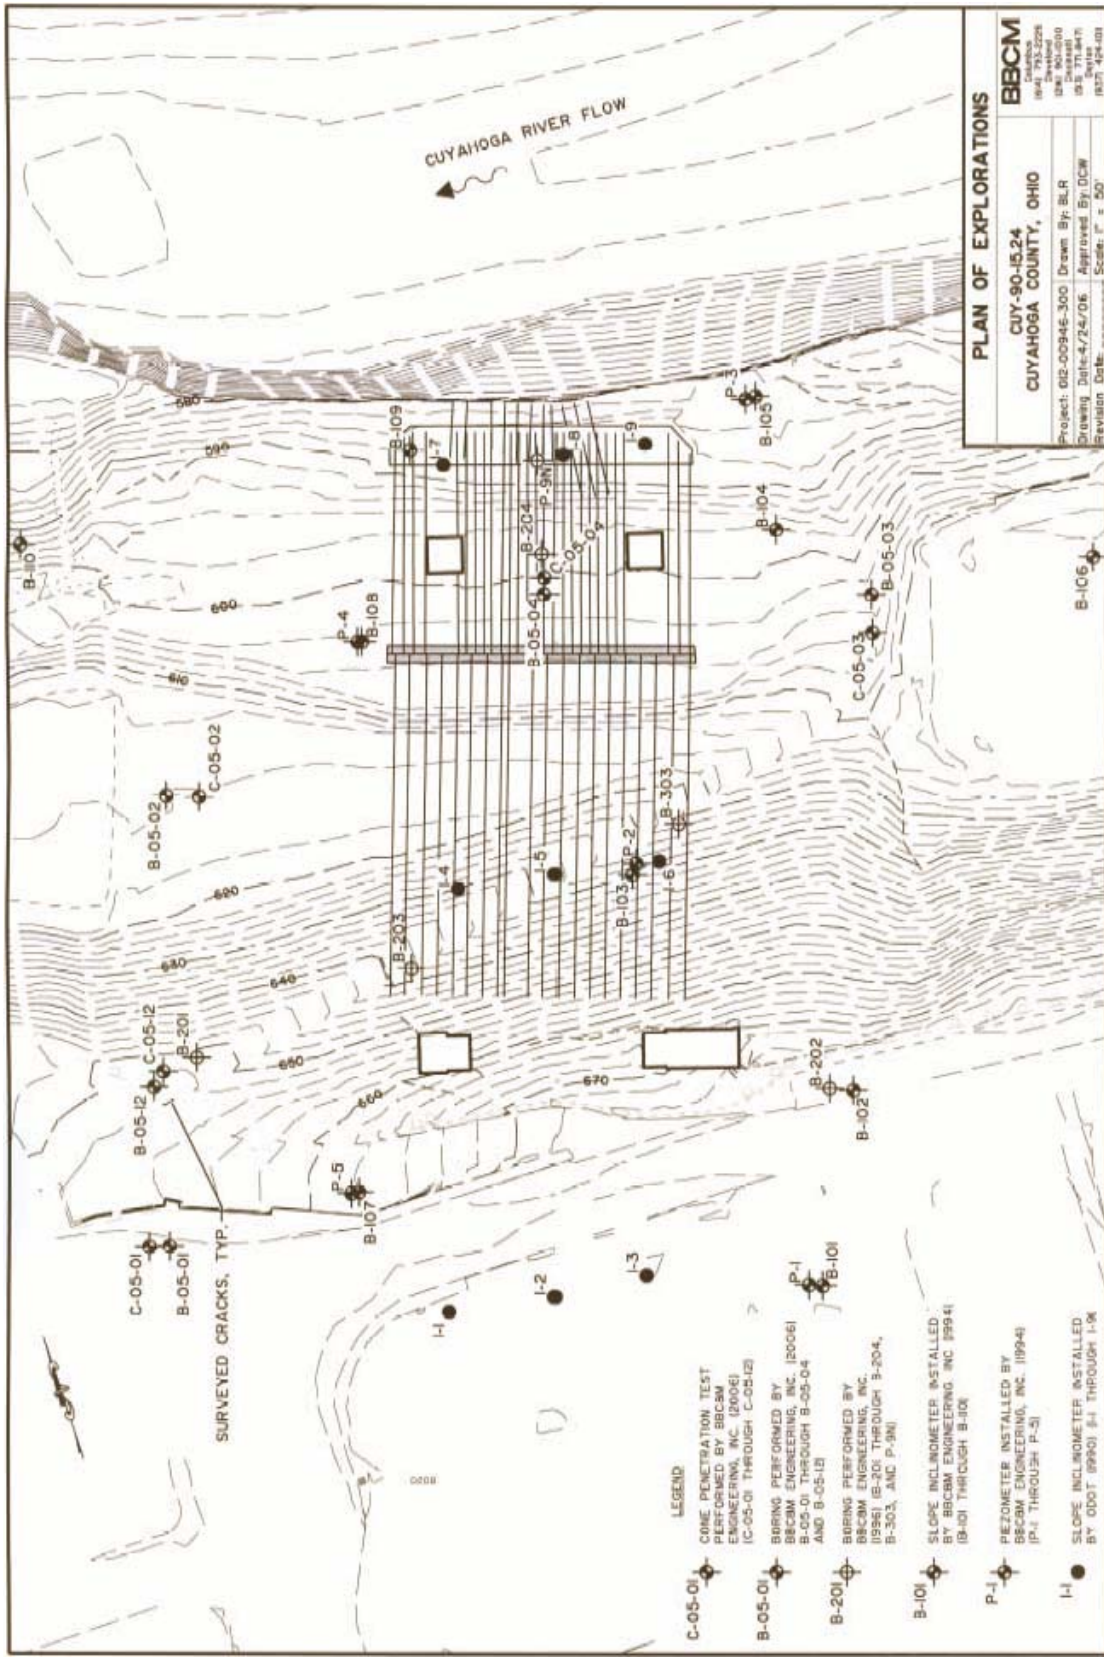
Plan view showing the location of the inclinometers in the project area
